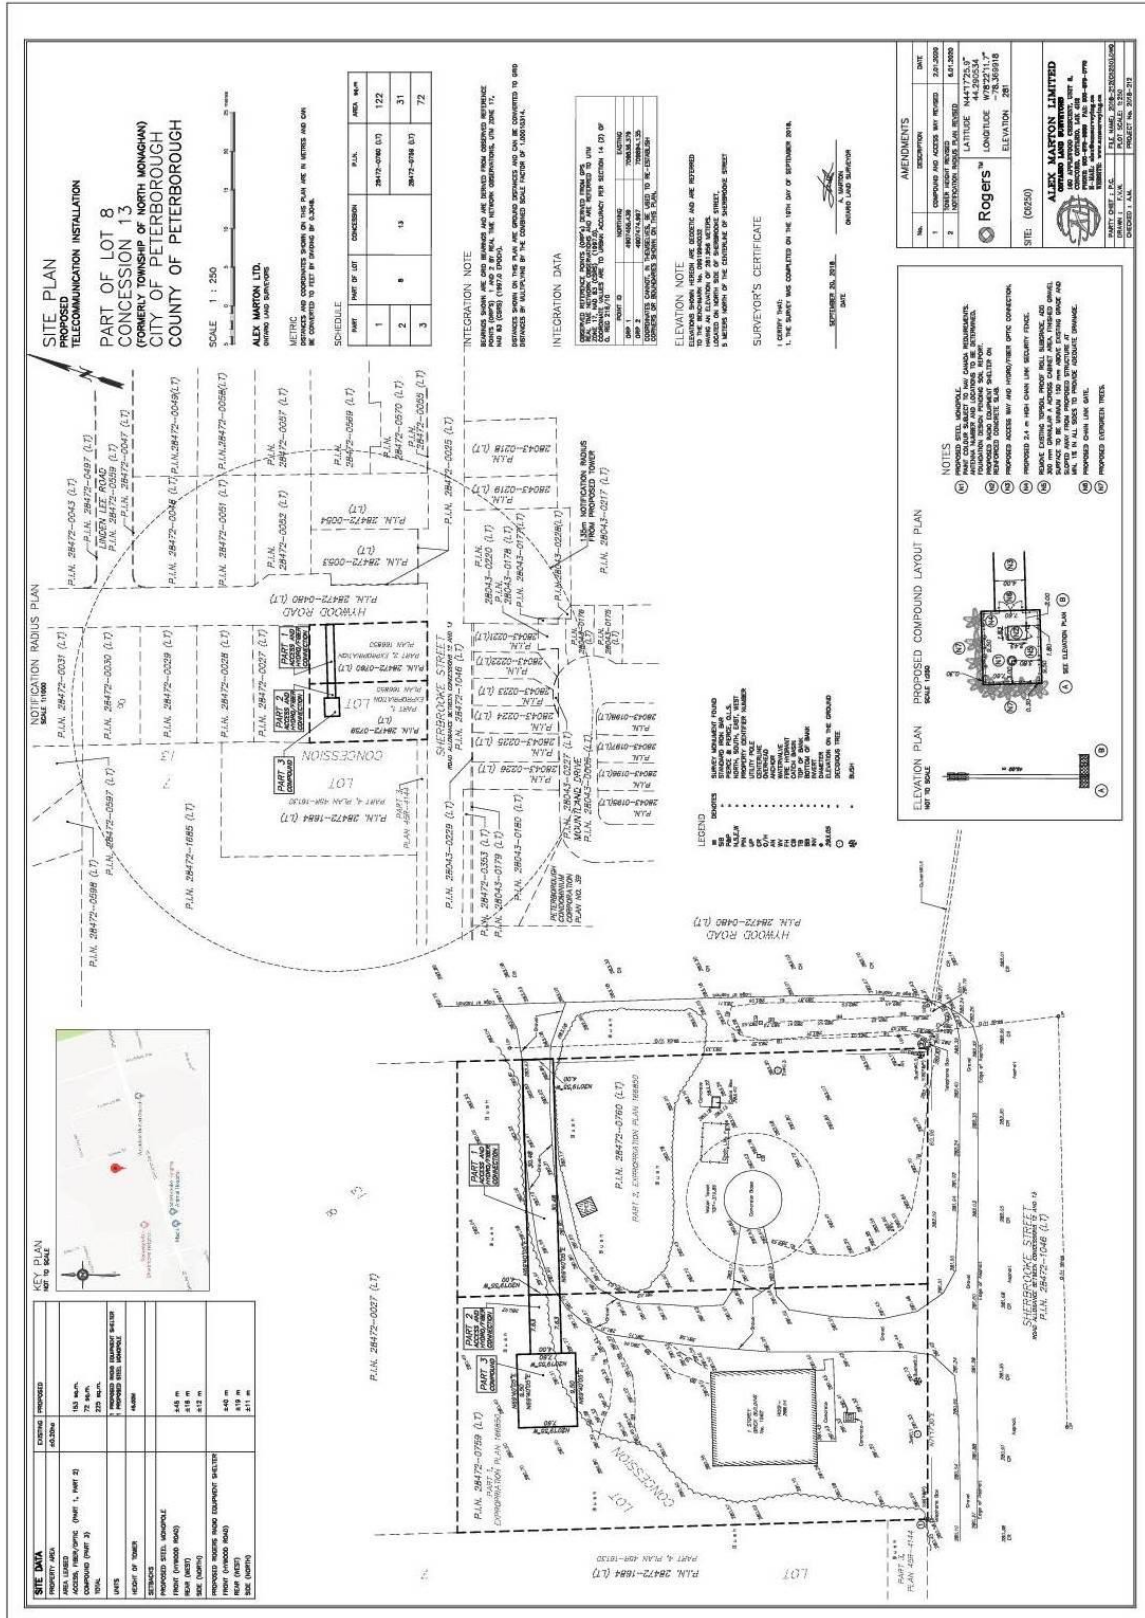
Exhibit C – Revised Concept Site Plan – Page 1 of 1
